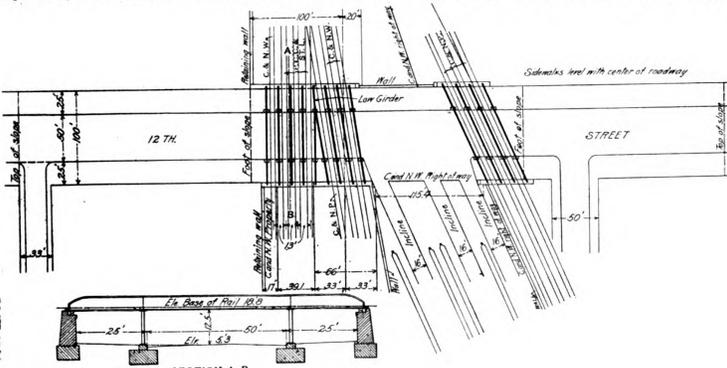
Street Plan of Subway—West Twelfth Street.
